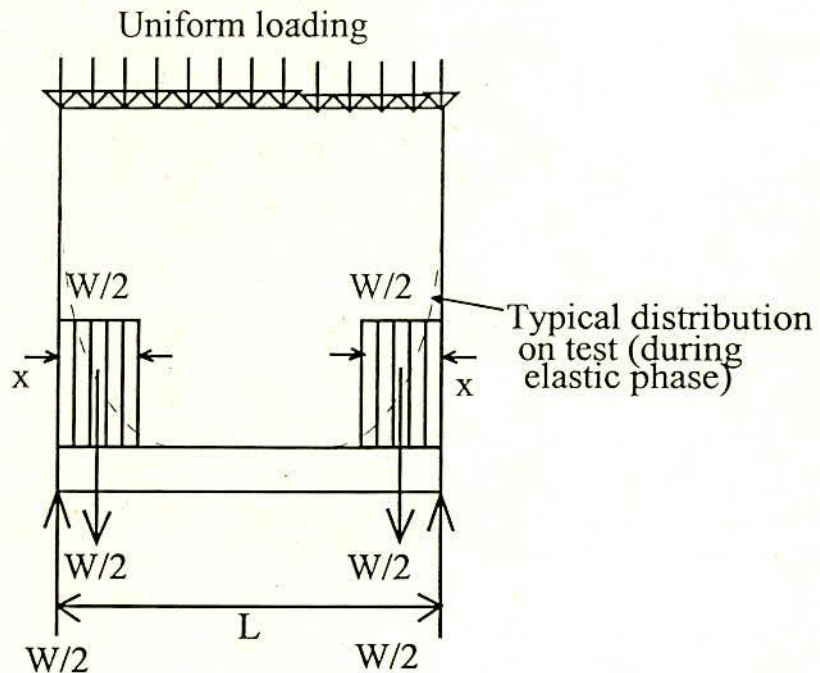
Assumed Equivalent Beam Loading at Failure of Wall
